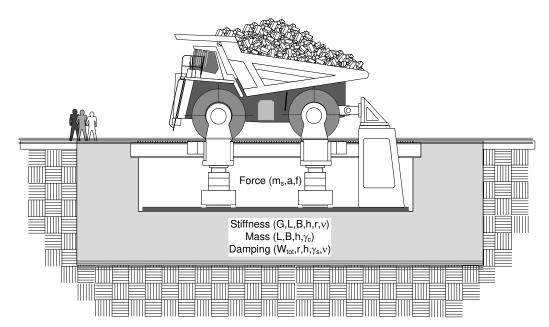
Large rigid concrete equipment foundation supporting a hydraulic test rig for heavy equipment
